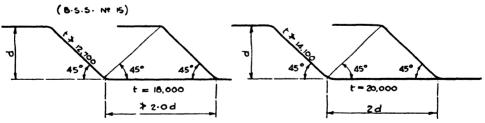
LIMITING STRESSES FOR ALTERNATIVE ARRANGEMENT OF INCLINED BARS.
